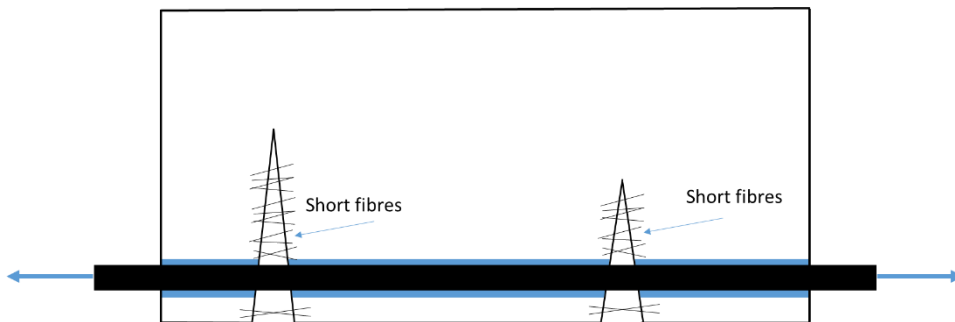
Crack development and control mechanism of a fibre-reinforced concrete
